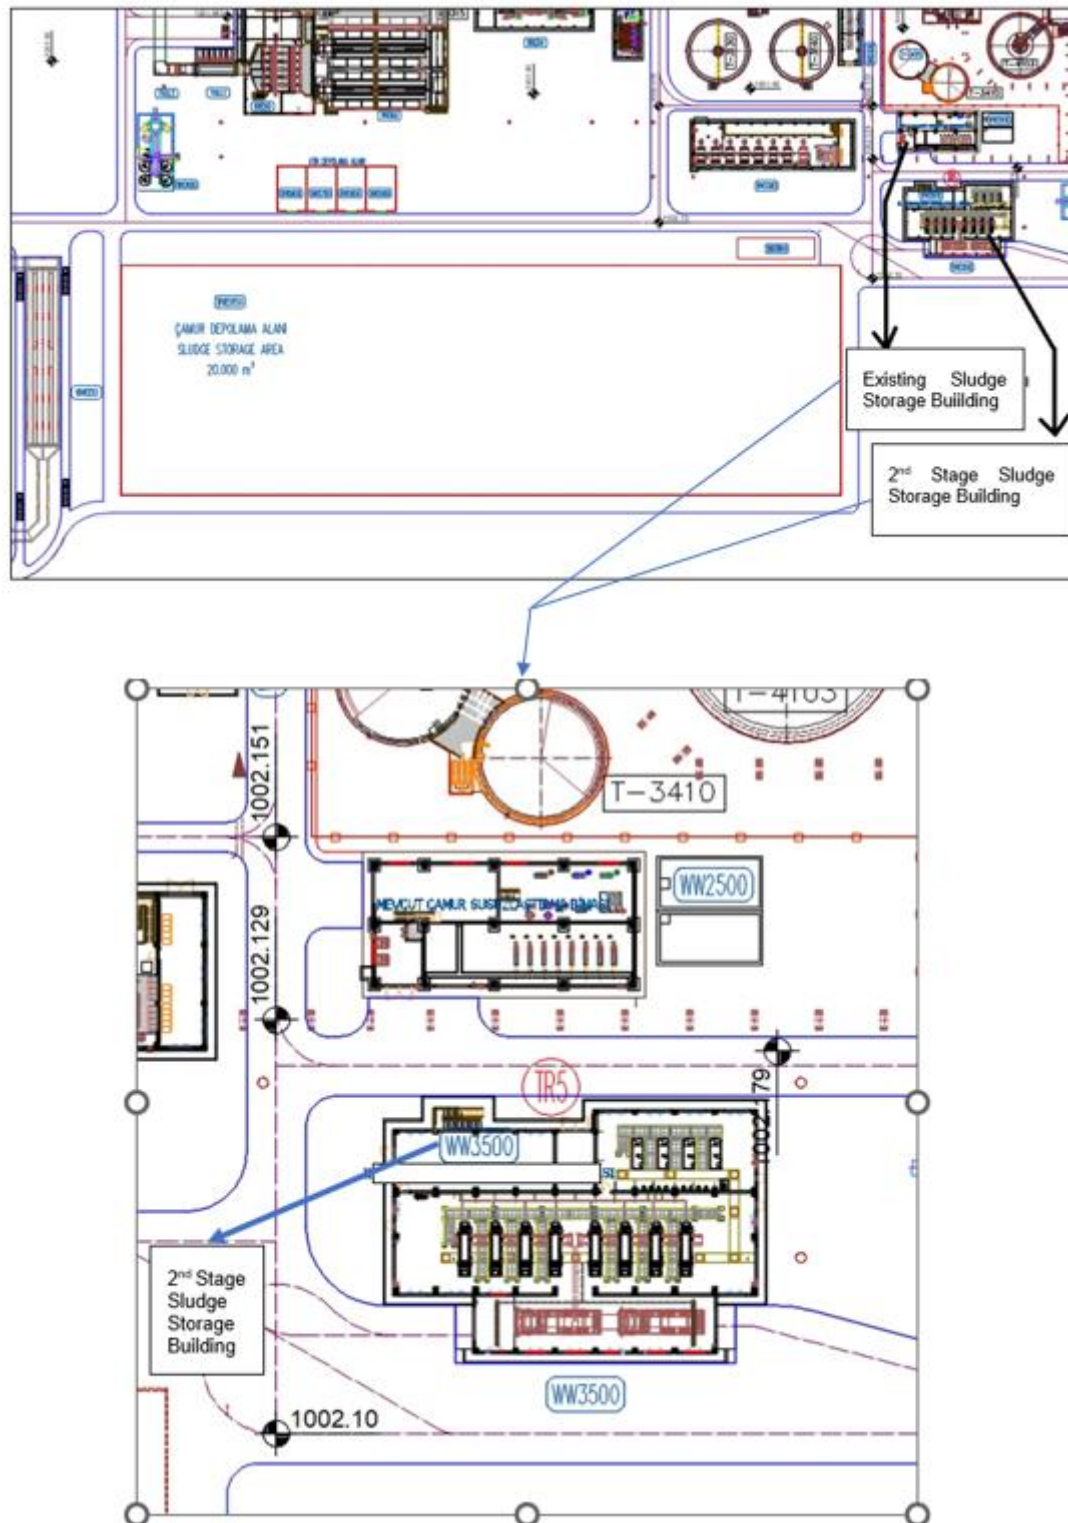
Sludge Storage Area and Existing and 2nd Stage Sludge Dewatering Buildings
